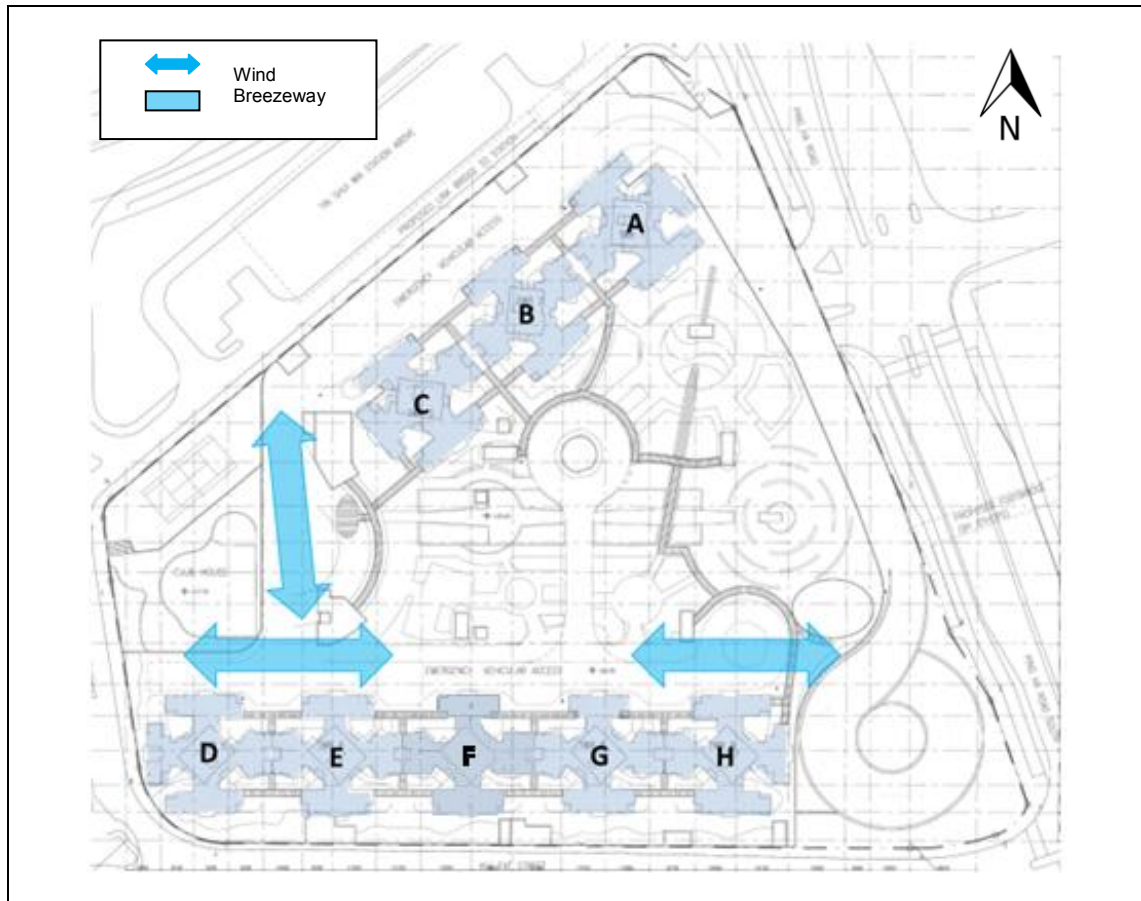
(a) Layout Plan for the Base Scheme (Approved Scheme in Feb. 2000)
